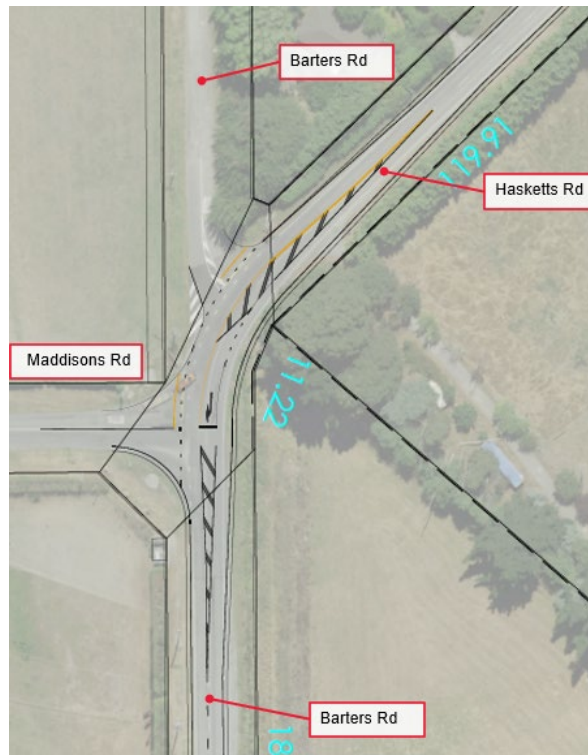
Barters Road / Hasketts Road / Maddisons Road Intersection – Concept Design
